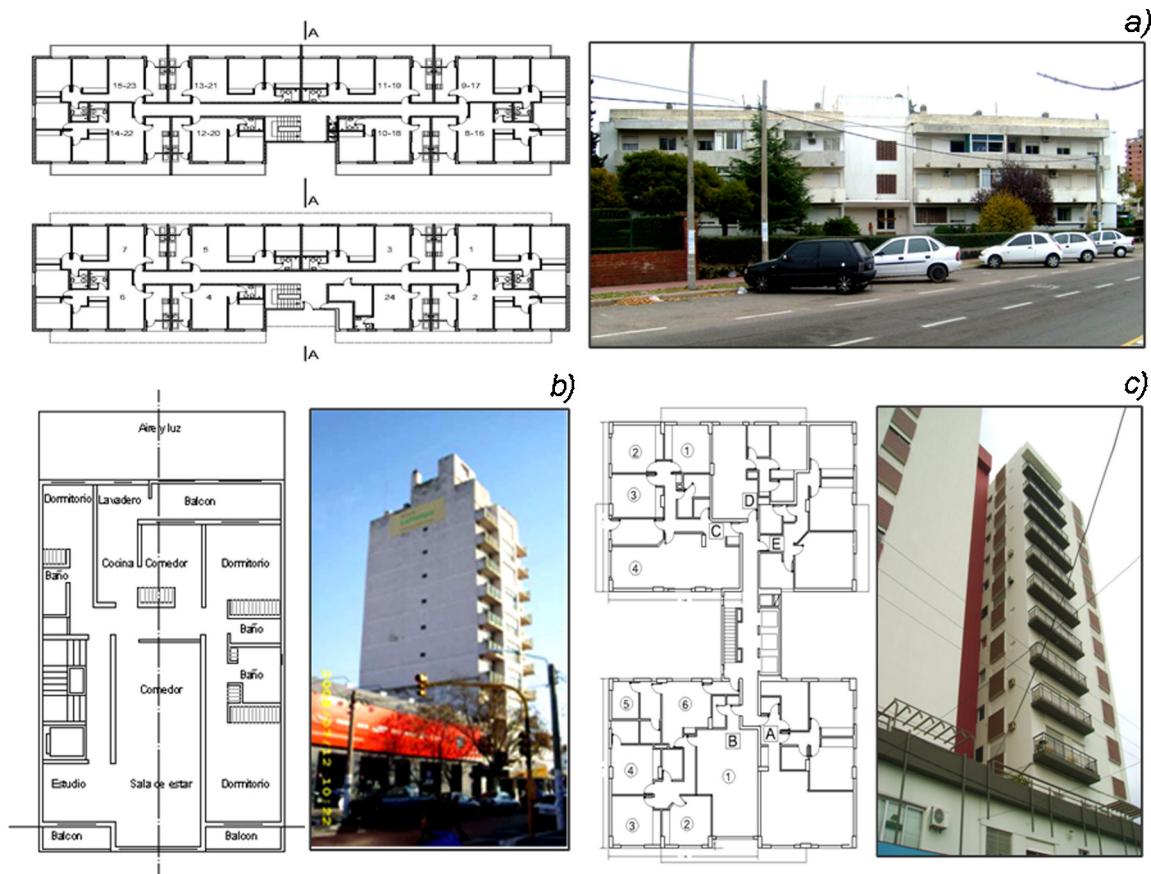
Plan and views of studying buildings. References: (a) multifamily building; (b) Avellaneda Tower; and (c) Gemelius Towers.
